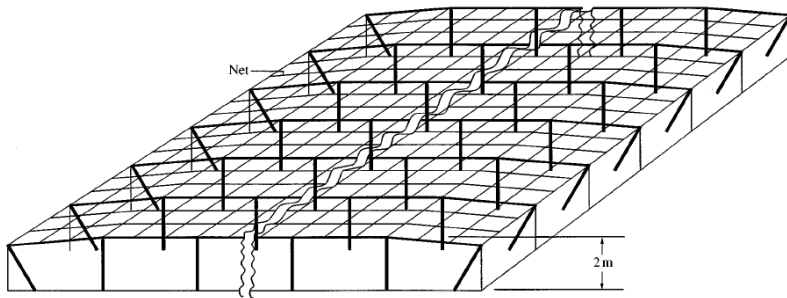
Typical structure of the 'Parral-type' greenhouse in Almeria (Spain)
